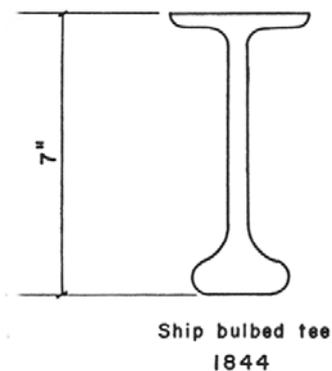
Bulb-tee, patented by Kennedy and Vernon for use as a deck beam in shipbuilding, 1844. (Jewett)
